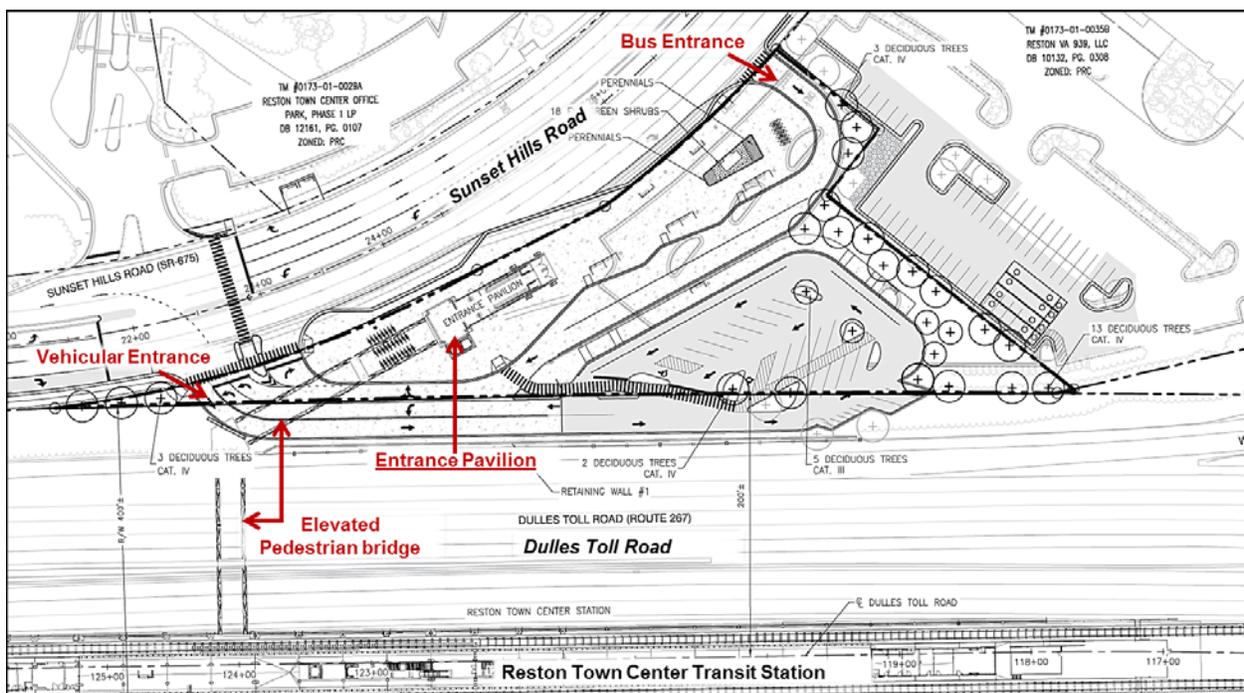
Proposed electrically-powered regional rail transit facilities, Source: SE Plat/ PRC Plan/Public Facilities Plan, Sheet 5
